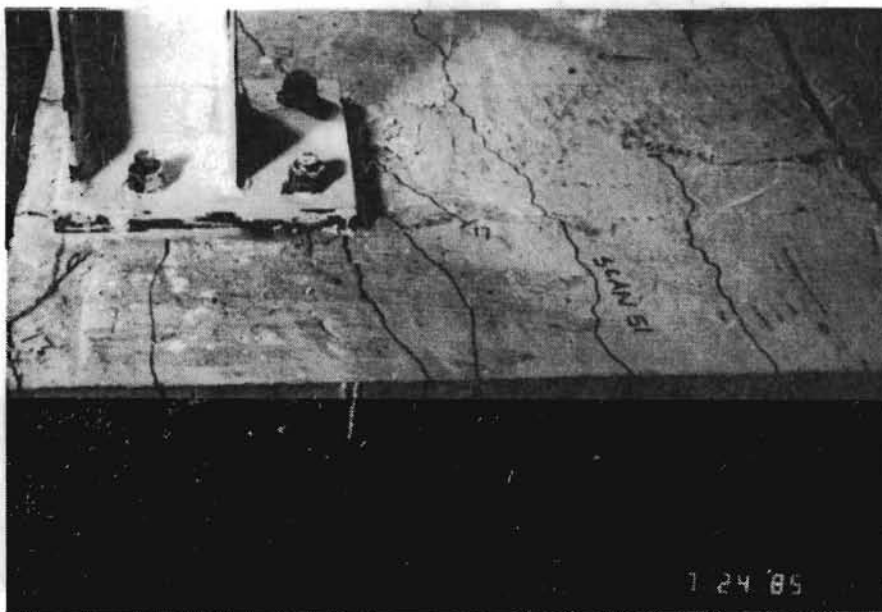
Flexural cracking behind west-end base plate
